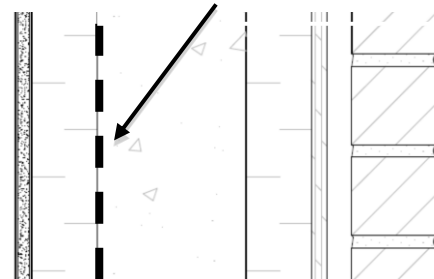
Condensation Plane for ICF Construction (Source: Twiddy, 2011)
